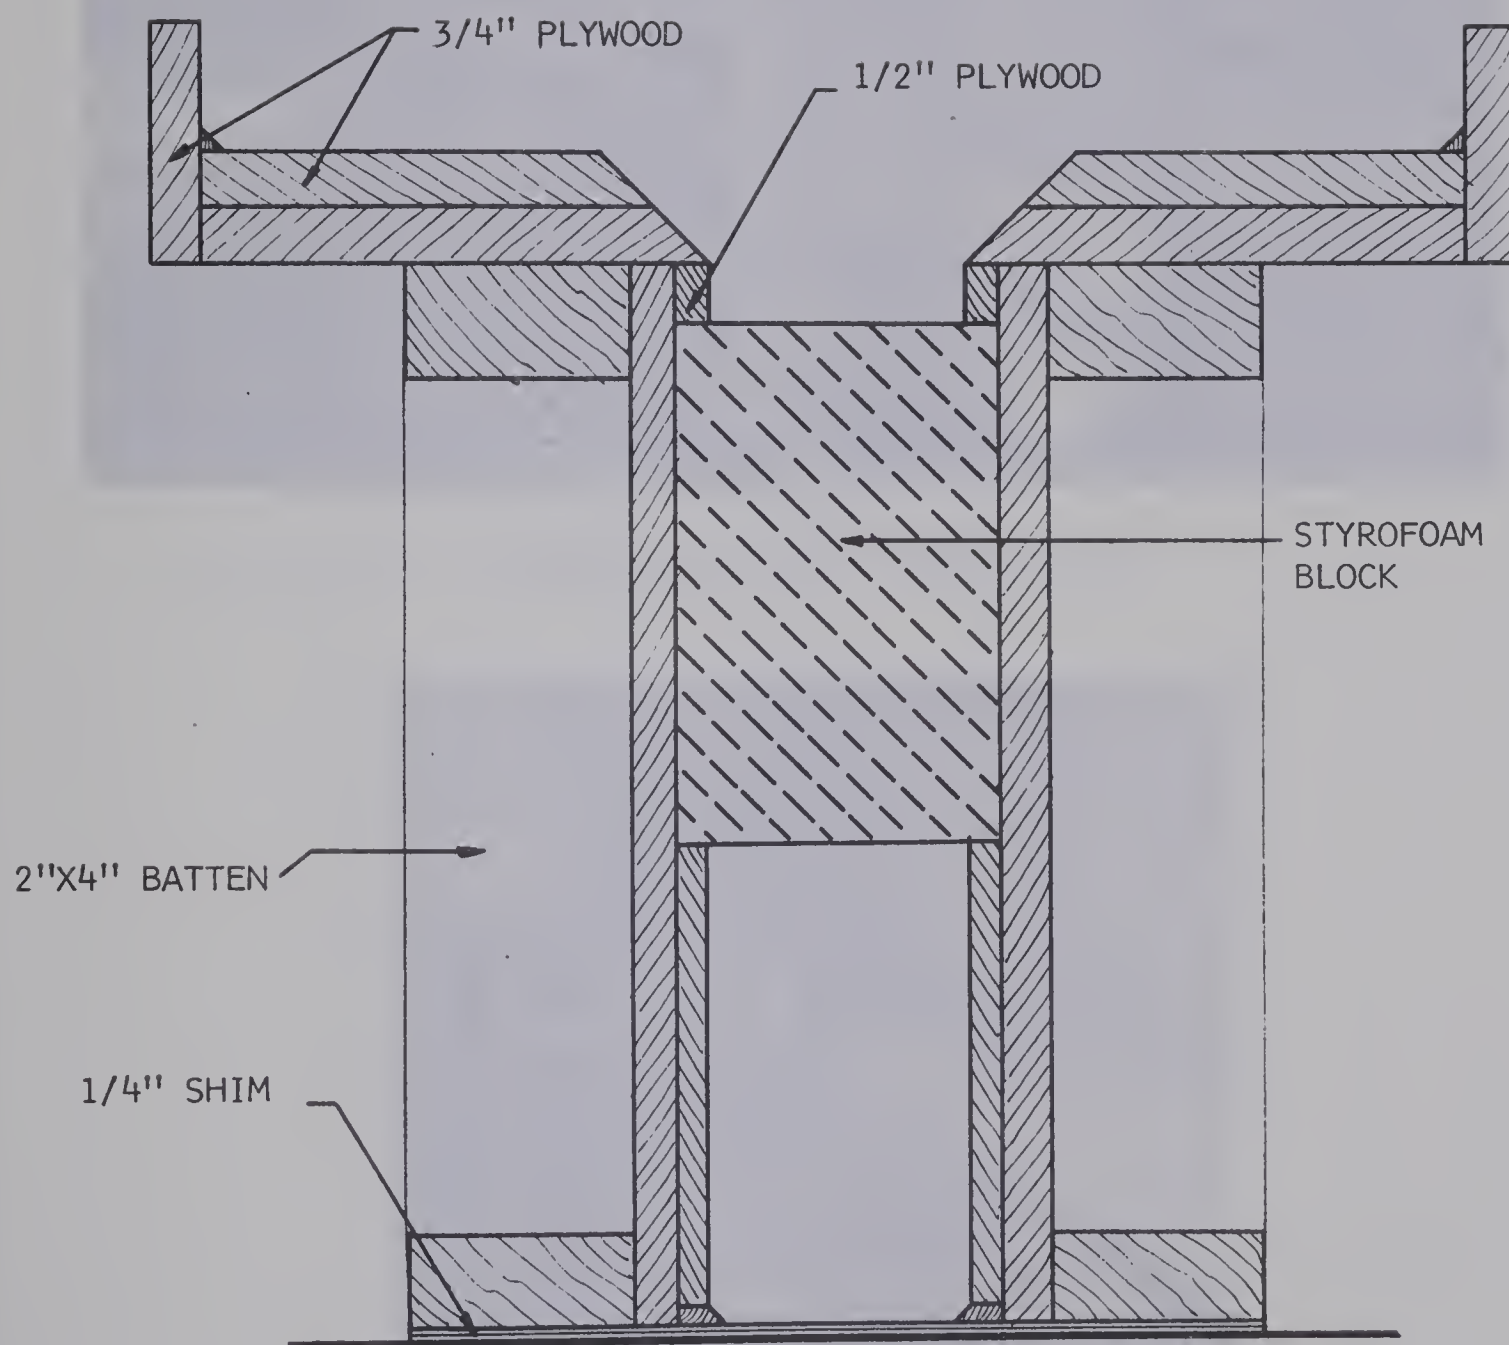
TYPICAL X-SECTION THROUGH FORMWORK
